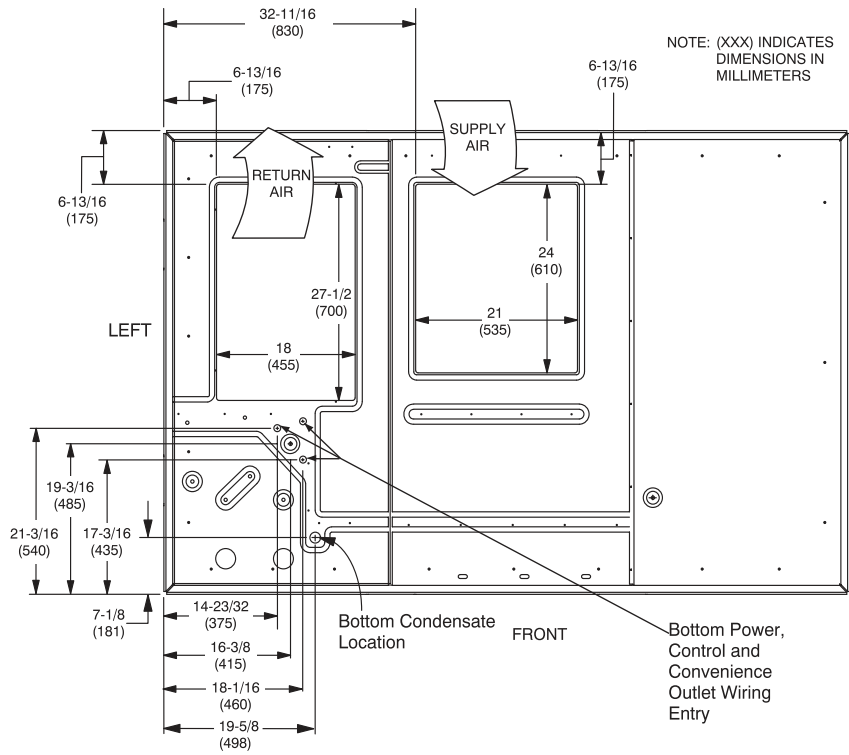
BOTTOM DUCT OPENINGS (FROM ABOVE)
